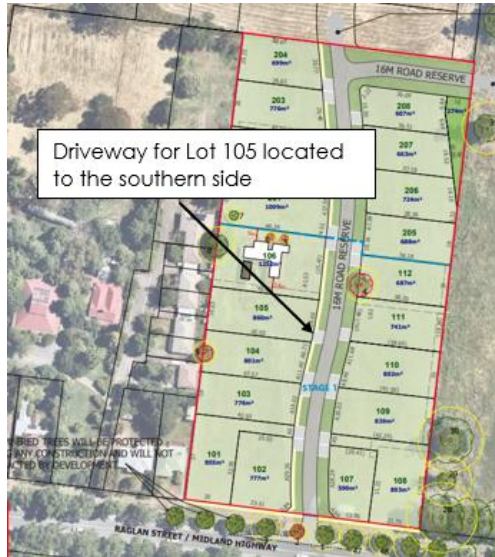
Endorsed subdivision plan showing location of driveways (Source: Endorsed plans for PA2302418)
